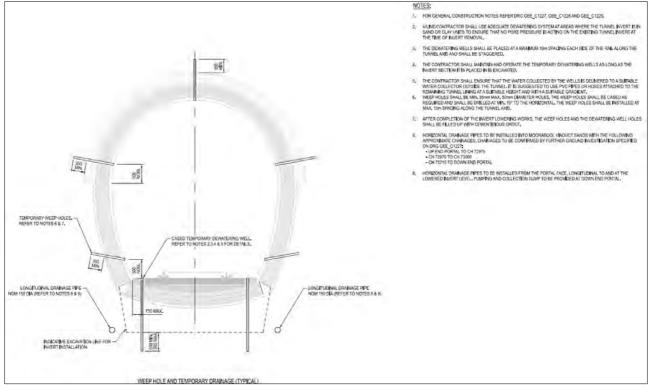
TYPICAL CROSS SECTION OF TUNNEL SHOWING WEEP HOLES AND TEMPORARY DRAINAGE SUPPORTING INVERT LOWERING WORKS. (SOURCE: AURECON/VLINE)
